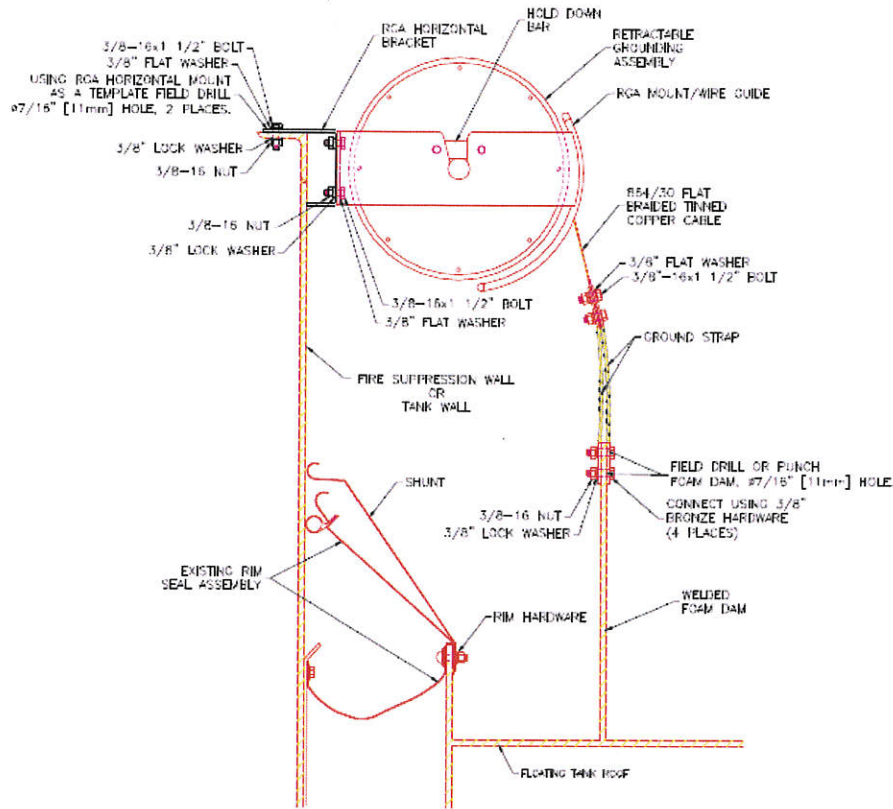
RGA Front View, Welded Foam Dam Shown
